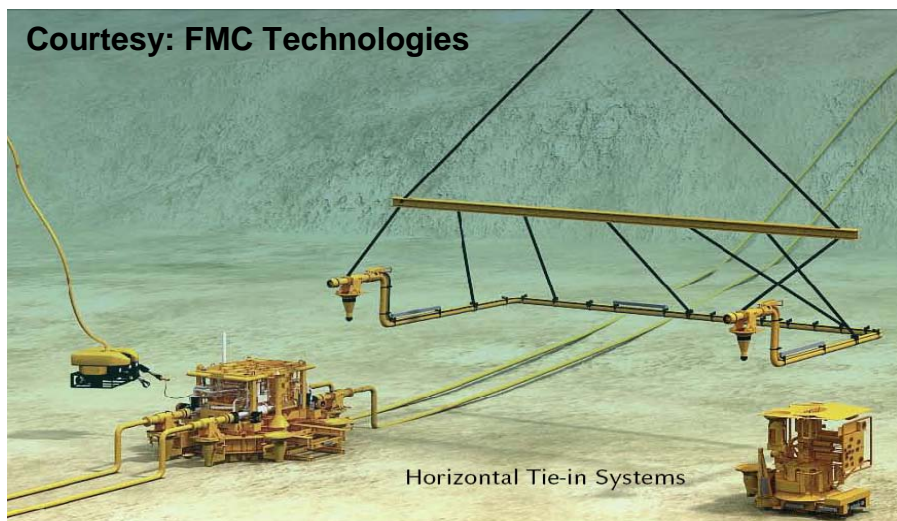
Jumper Installation – Horizontal Tie-in System
